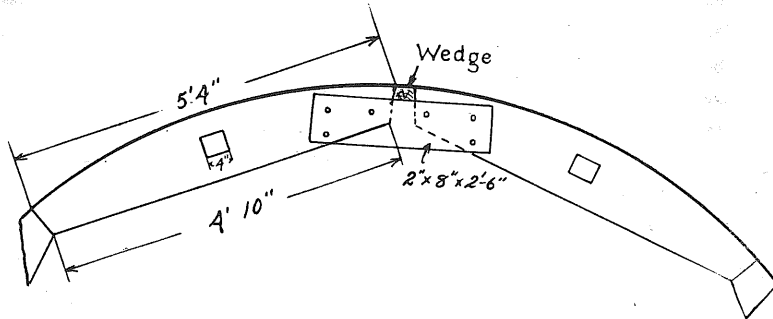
INSIDE SECTION OF HOMEMADE FORM
